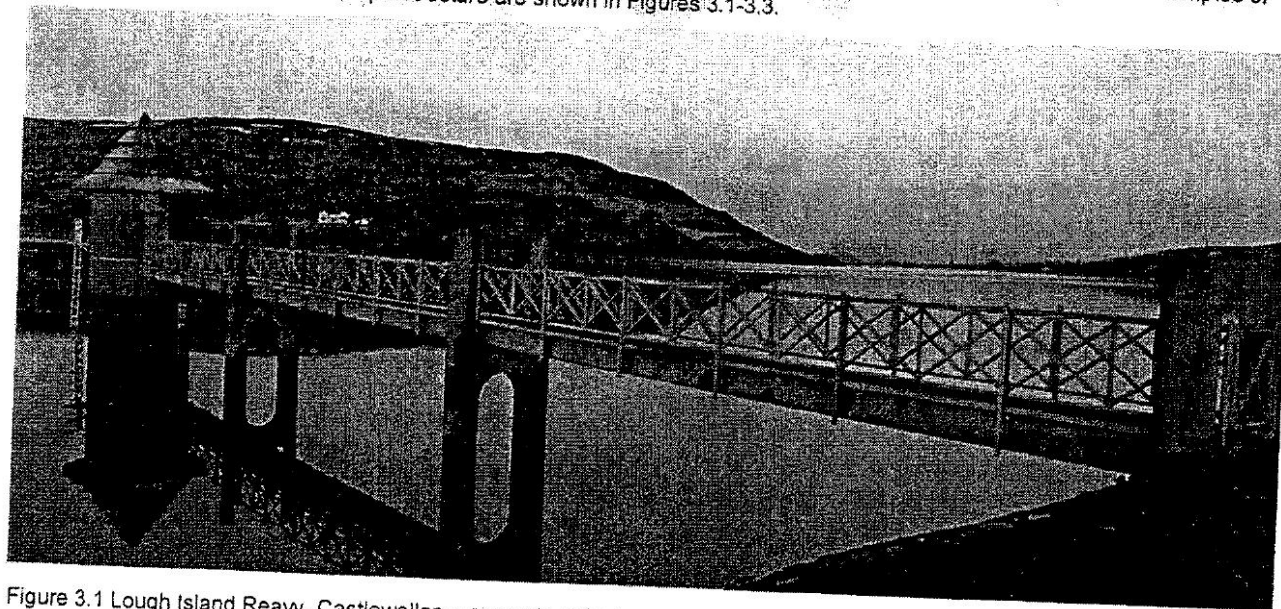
Lough Island Reavy, Castlewelan – concrete valve tower superstructure
